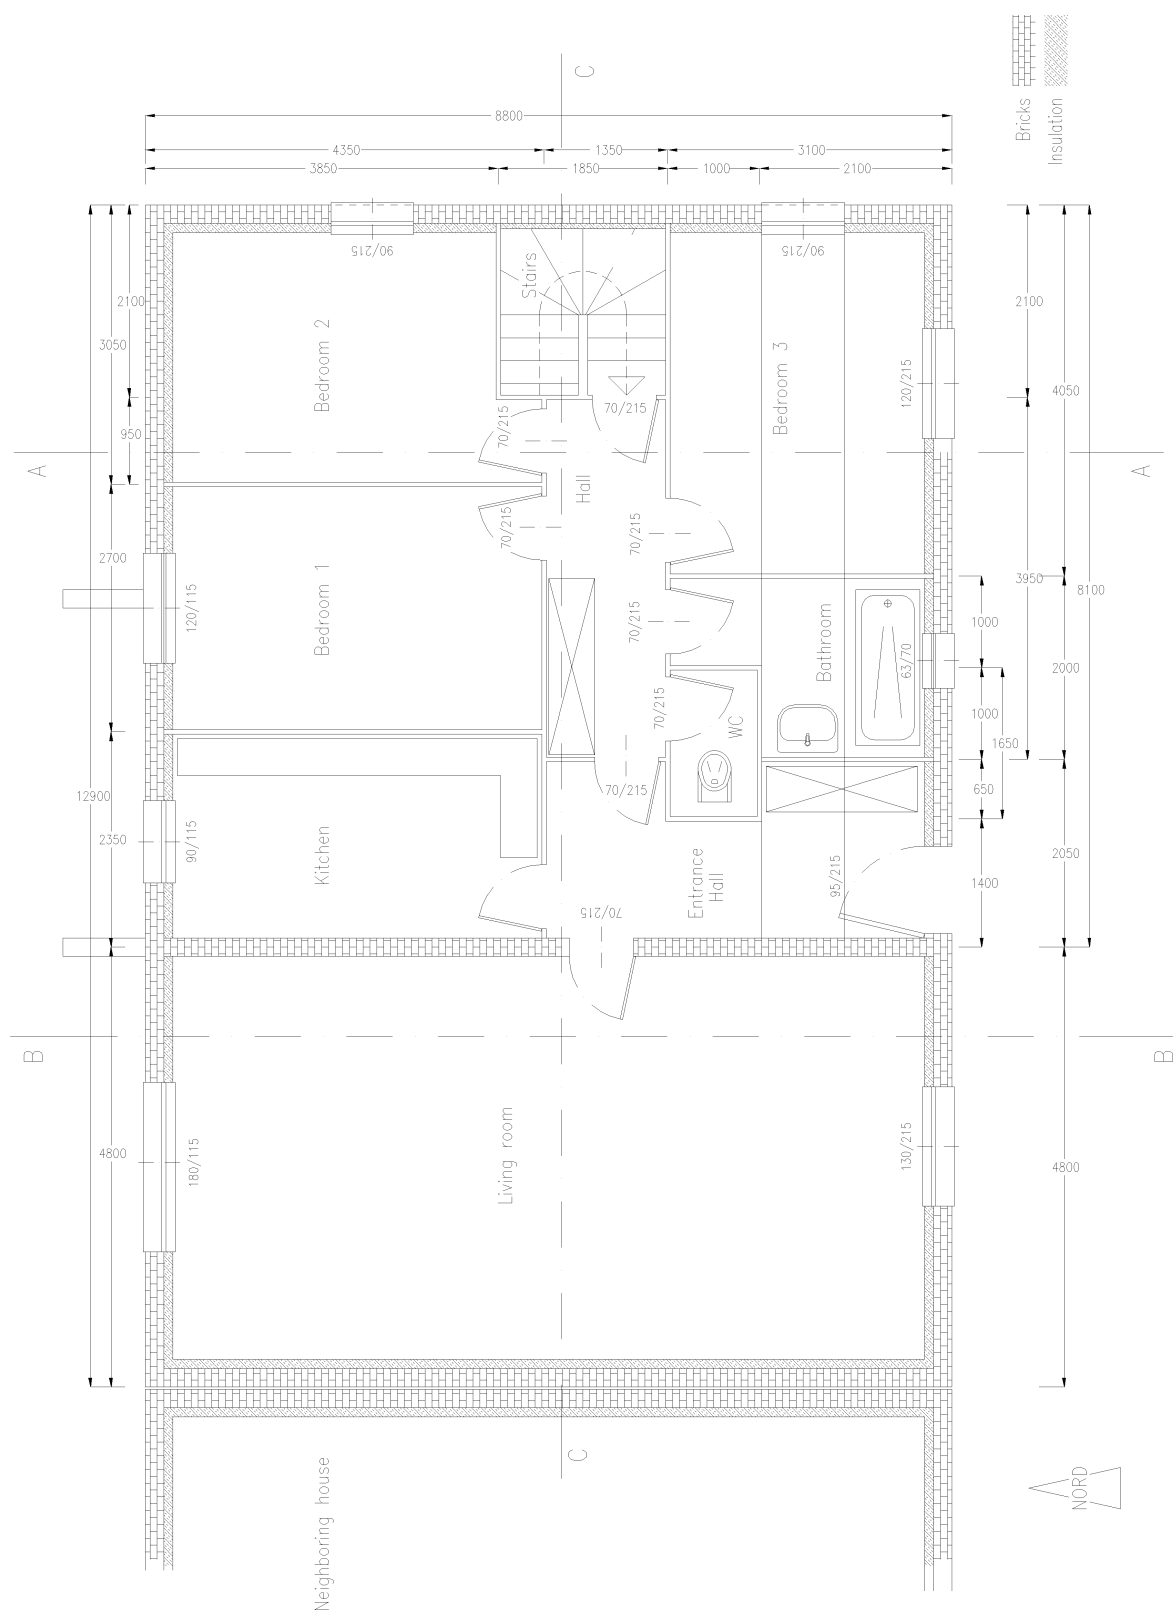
Ground floor plan with external dimensions used for the simplified method
